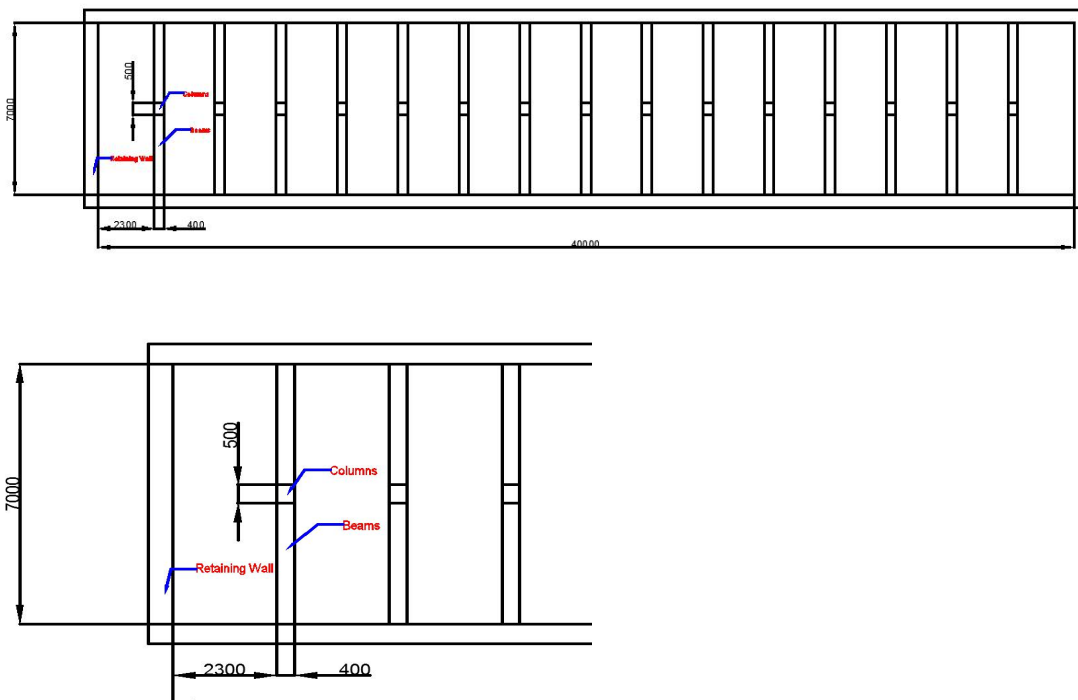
5: Simple reservoir layout of the Columns, Beams and Retaining Walls
